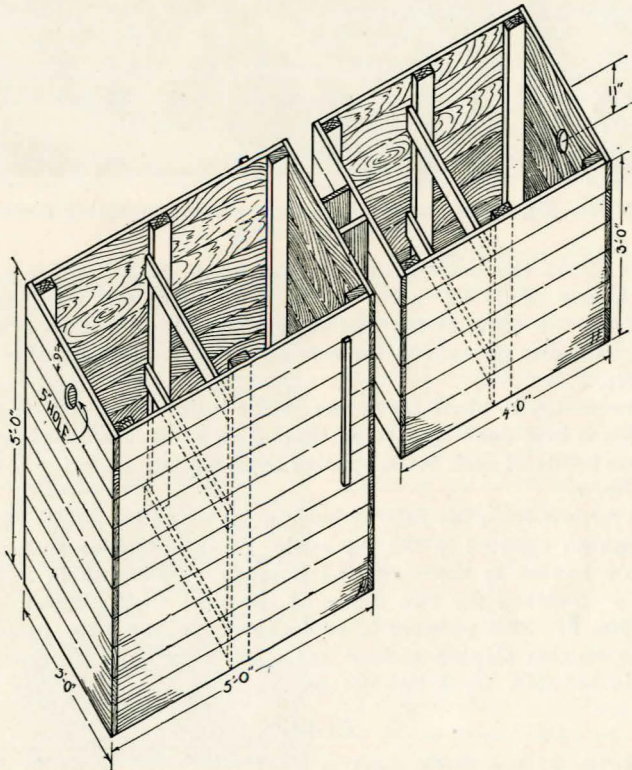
Inside forms, showing bracing to prevent bulging of forms
